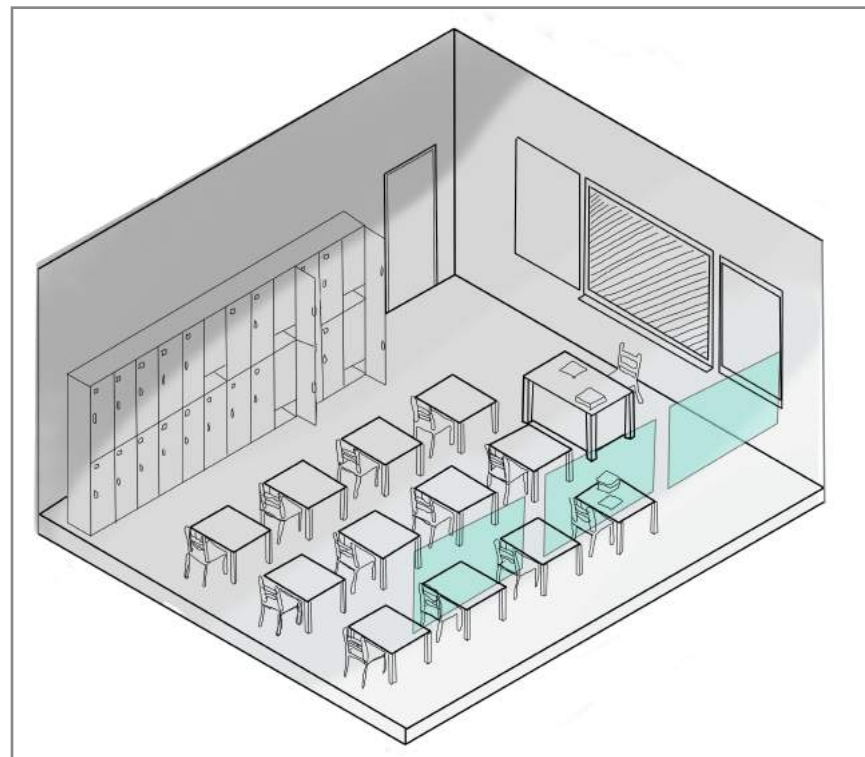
"TRADITIONAL SCHOOL" FLOOR PLAN
